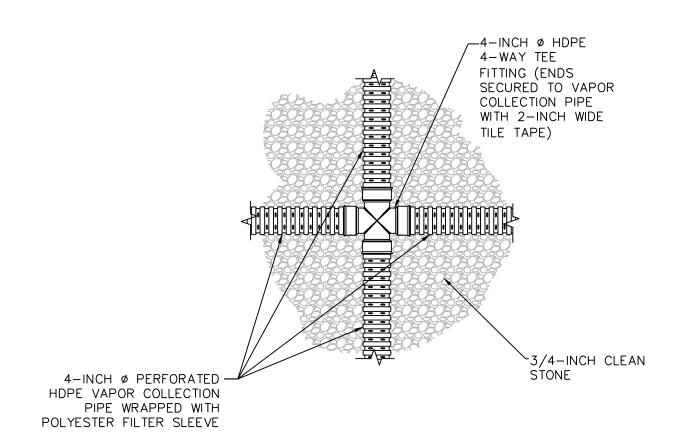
TYPICAL COUPLER CONNECTION FOR VAPOR COLLECTION PIPE (PLAN VIEW)
